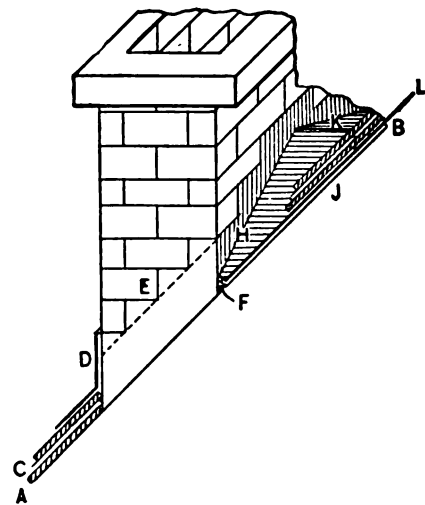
Flashing Around a Chimney on a Shingle Roof, Showing Cant Board in Rear
